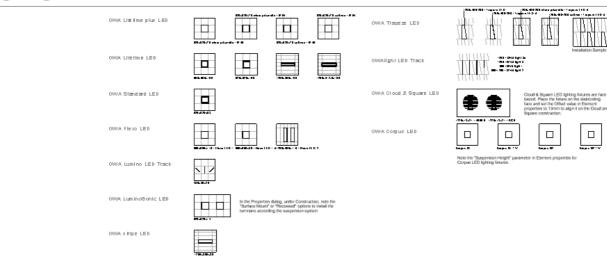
Ceiling Plan View in the file Revit Lighting Fixtures Library.rvt
